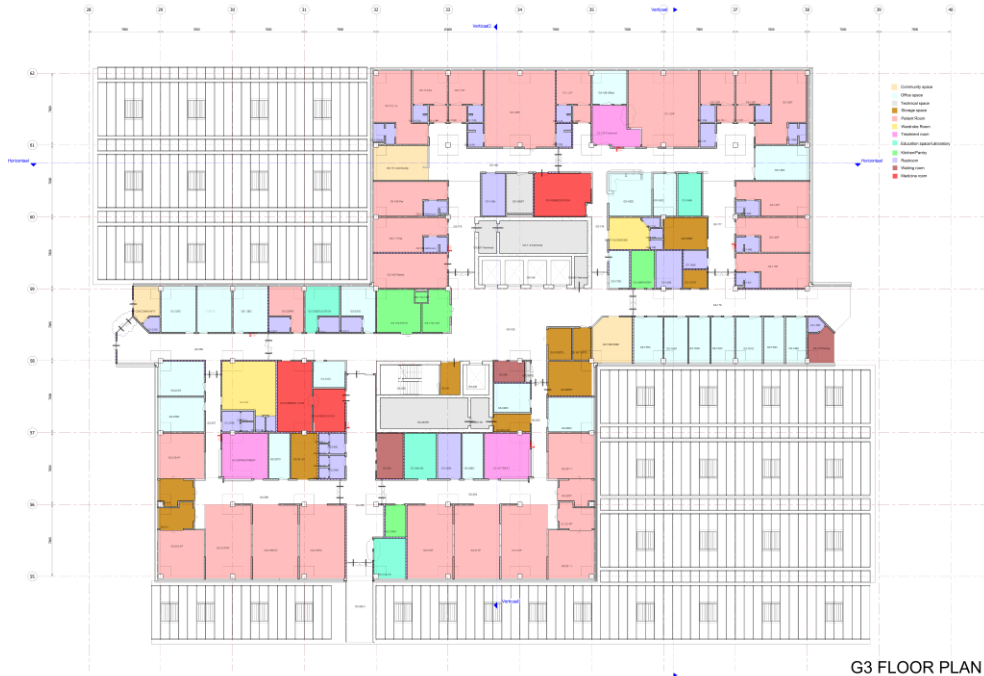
3rd floor plan of building block G, showing the program and circulation
